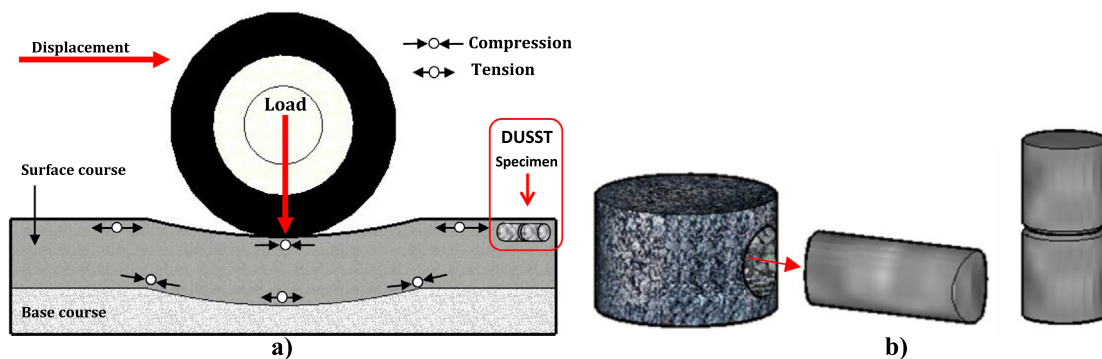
a) Stress state of the asphalt layers on a pavement and b) DUSST specimen manufacture scheme.
